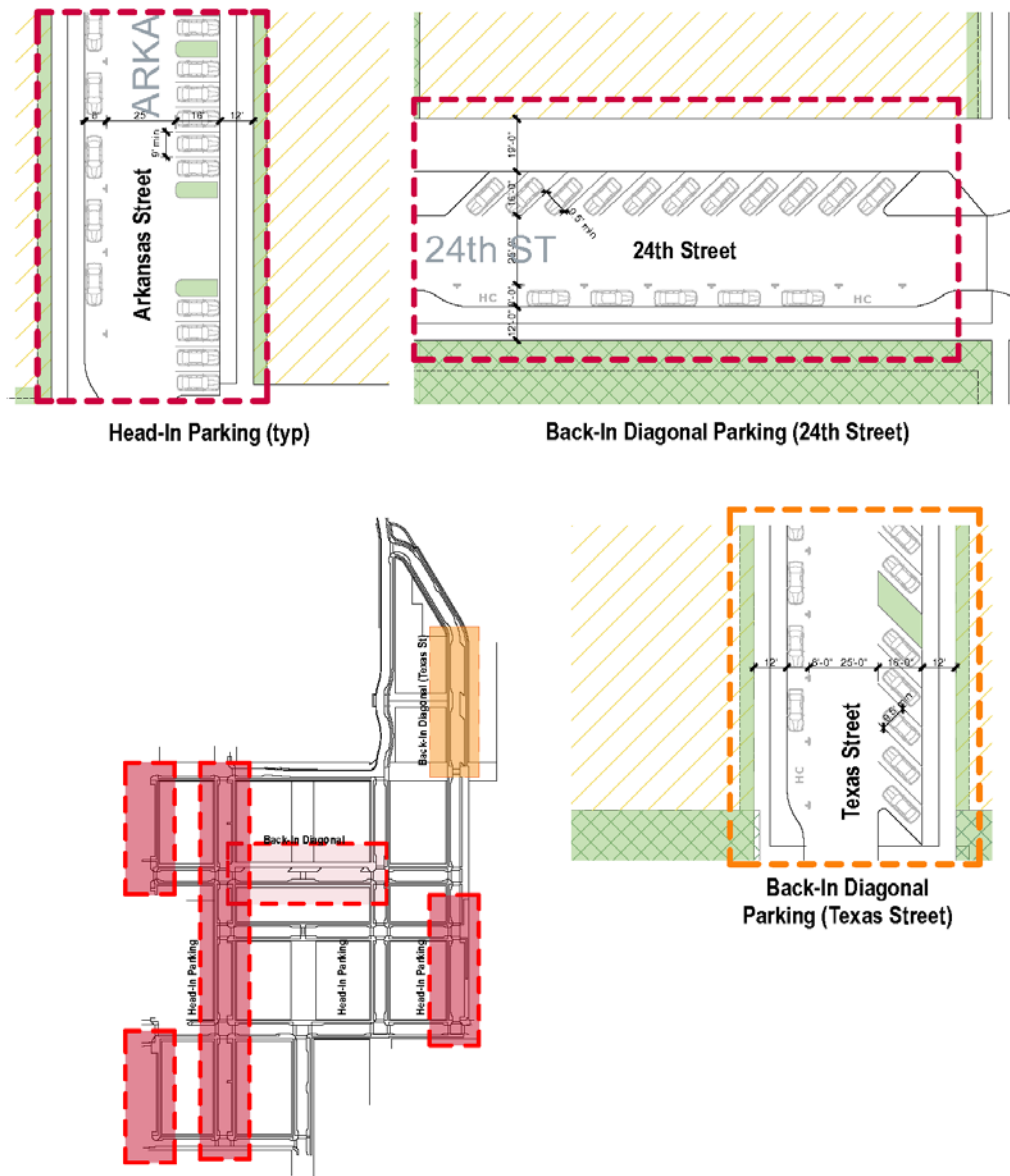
Typical Head-In and Back-in Parking Details and Location Map
